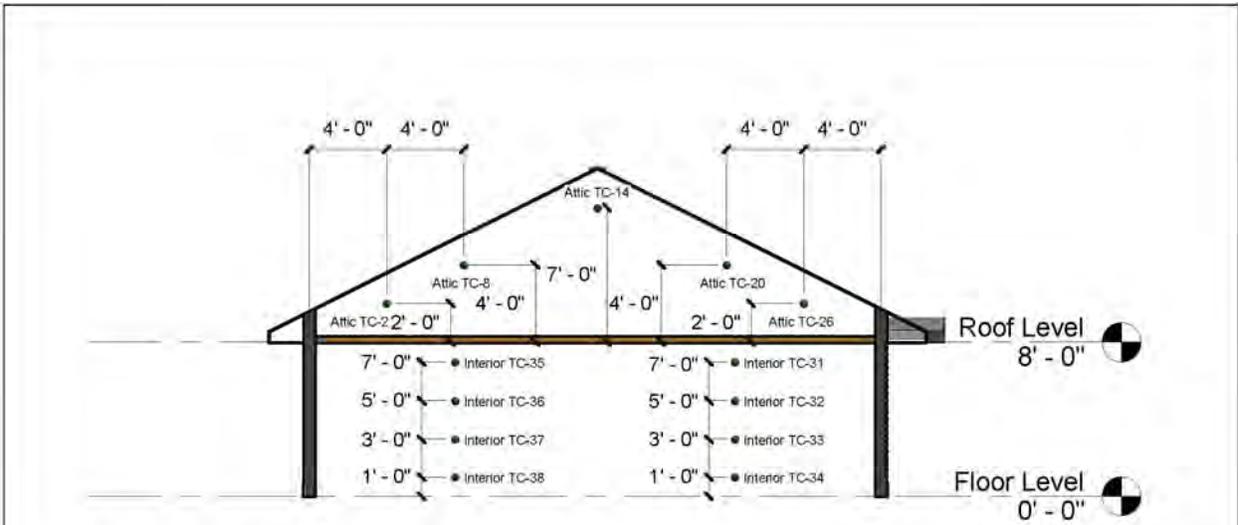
Full Scale Attic Sensor Elevation View Right & Left
